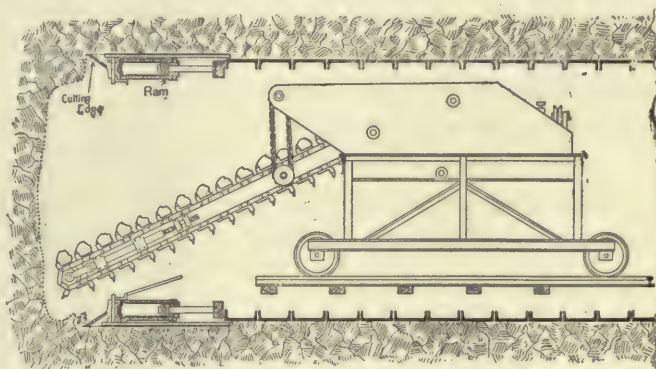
THOMPSON LADDER EXCAVATOR USED ON THE CENTRAL LONDON RAILWAY.
